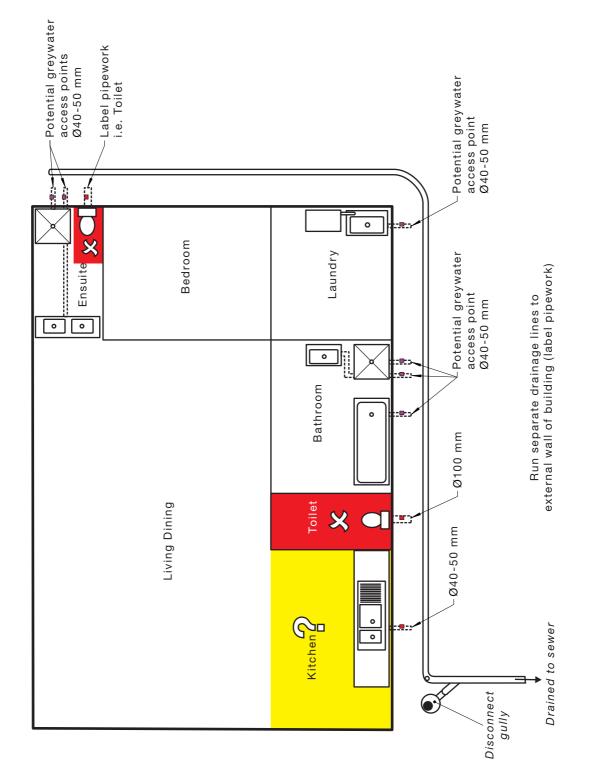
NEW HOUSE DESIGN FOR GREYWATER READY DRAINAGE SYSTEMS—PLAN VIEW OF FIGURE 7.1
